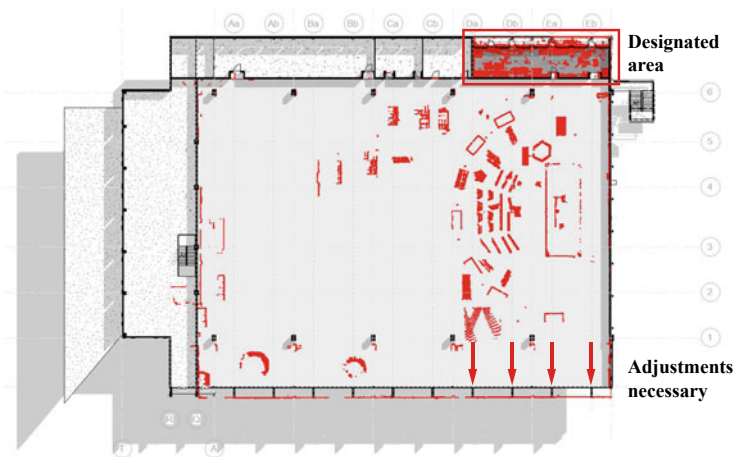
First-floor point cloud overlapping Revit plan to check for improvements
